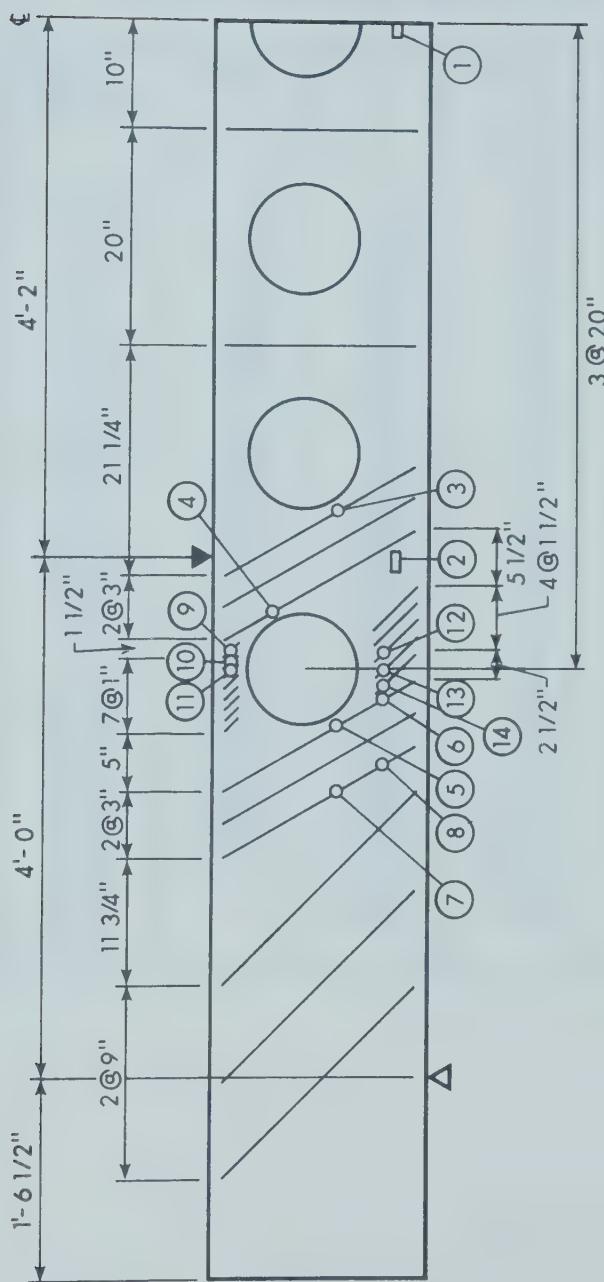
BEAM AD-12 REINFORCEMENT AND GAUGE DETAILS
